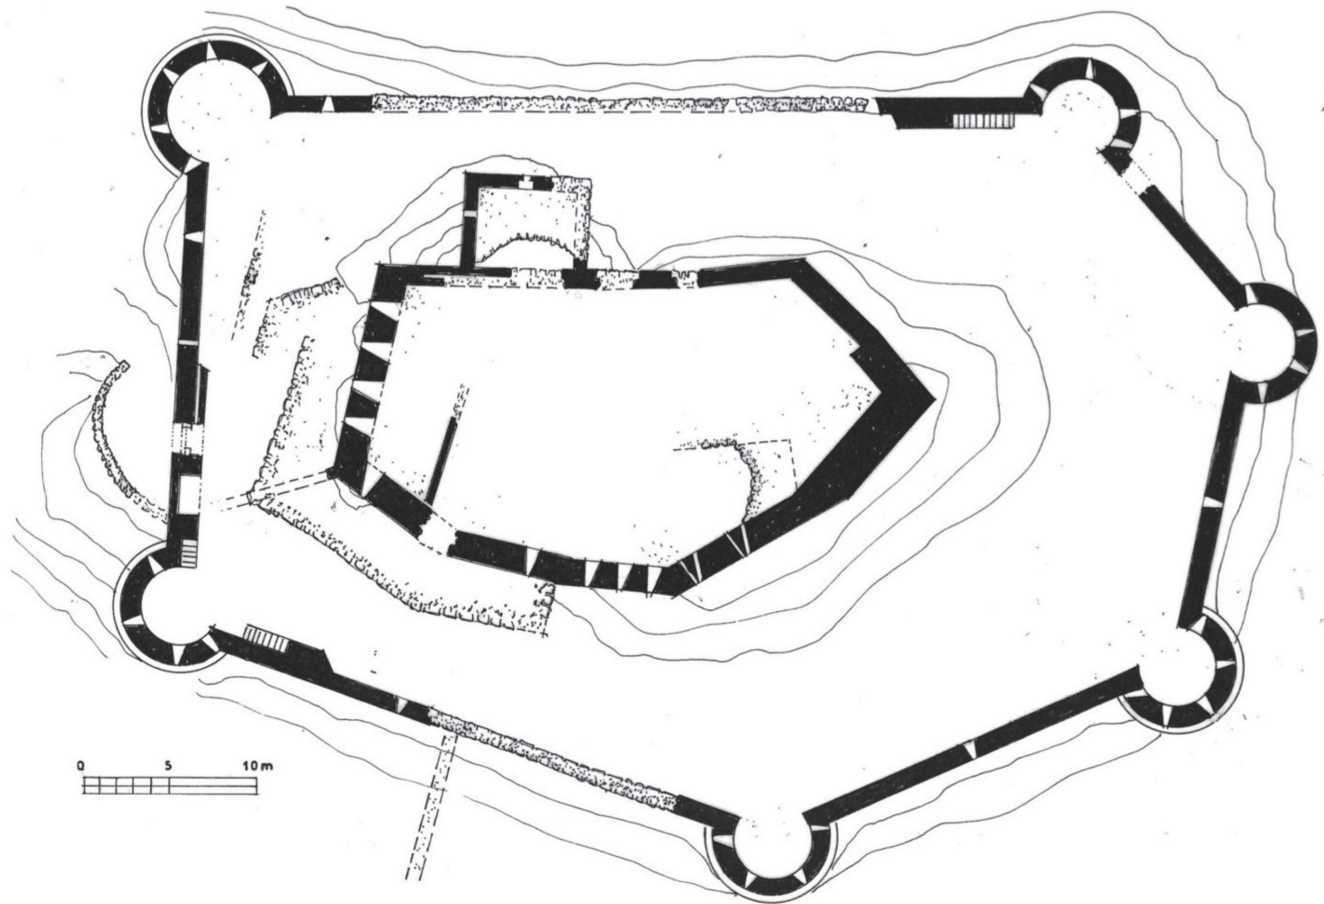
Plan of Aguilar castle (Lucien Bayrou)
